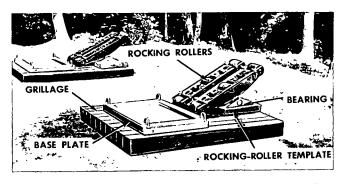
Base plote and racking rollers in position on grillage before launching bridge.
